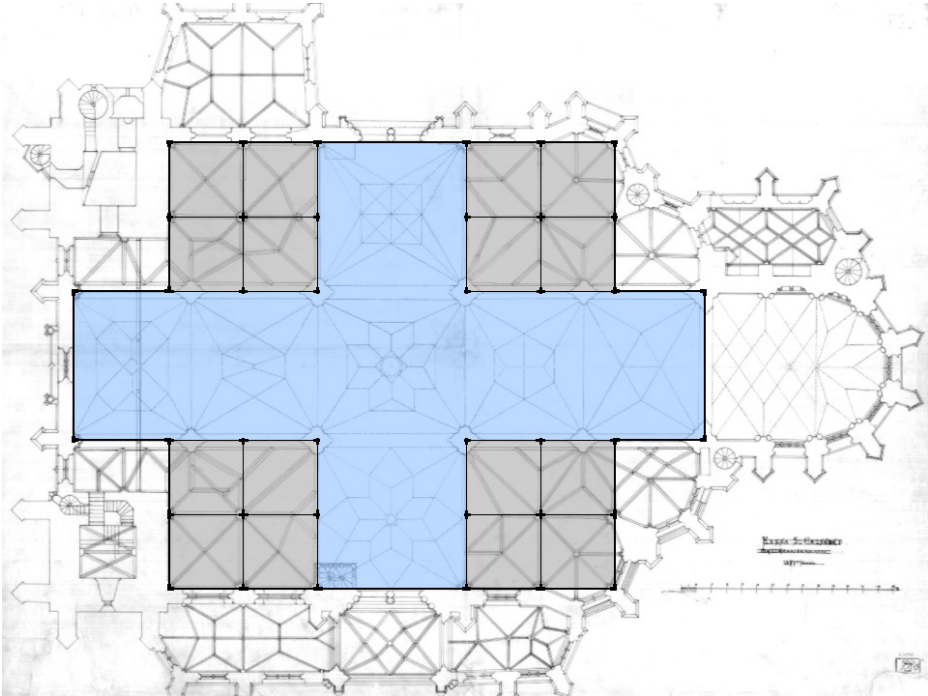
Ground plan of the Church of St Elizabeth in Košice before the nineteenth century reconstruction, highlighting the high spaces with blue (nave, transept) and the lower spaces (grey) between their arms. Source: Author's work, based on drawing K.6903 in the collection of the Hungarian Museum of Architecture and Monument Protection Documentation Centre.
